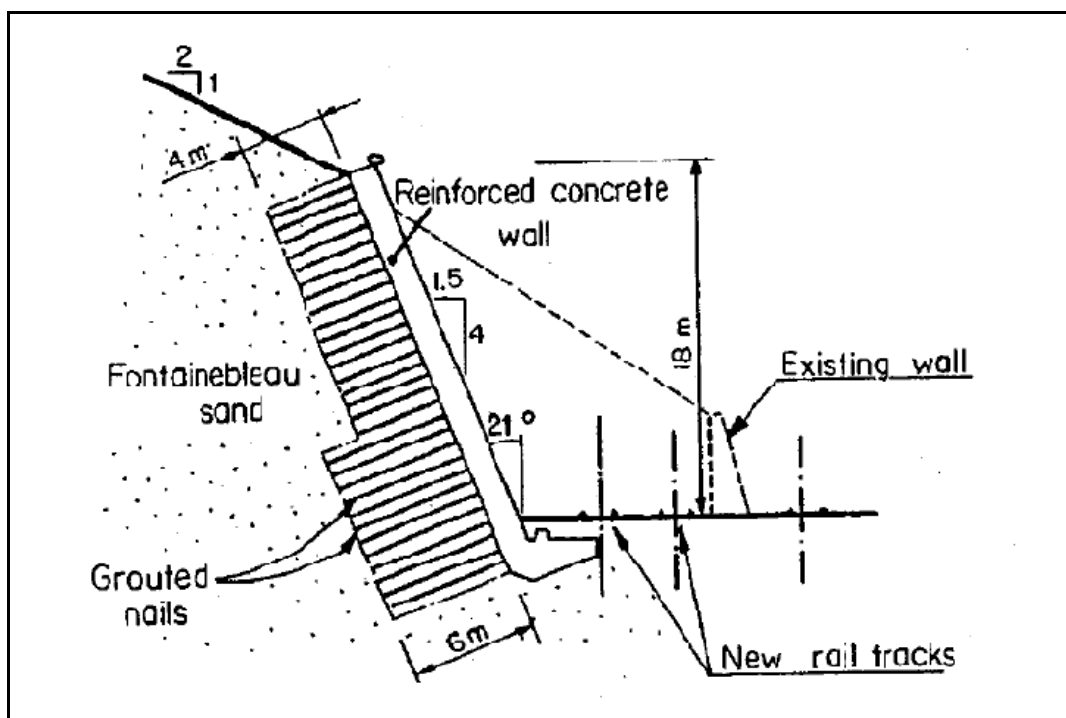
Cross-section of the first soil nailed wall at Versailles, France, 1972/73 (Rabejac and Toudic, 1974)
